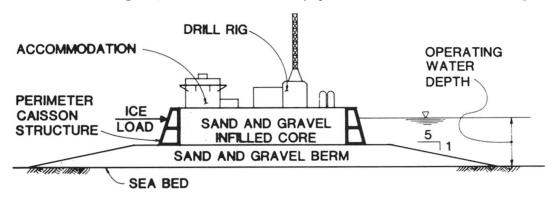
Typical Cross-Section, Caisson-Retained Island
